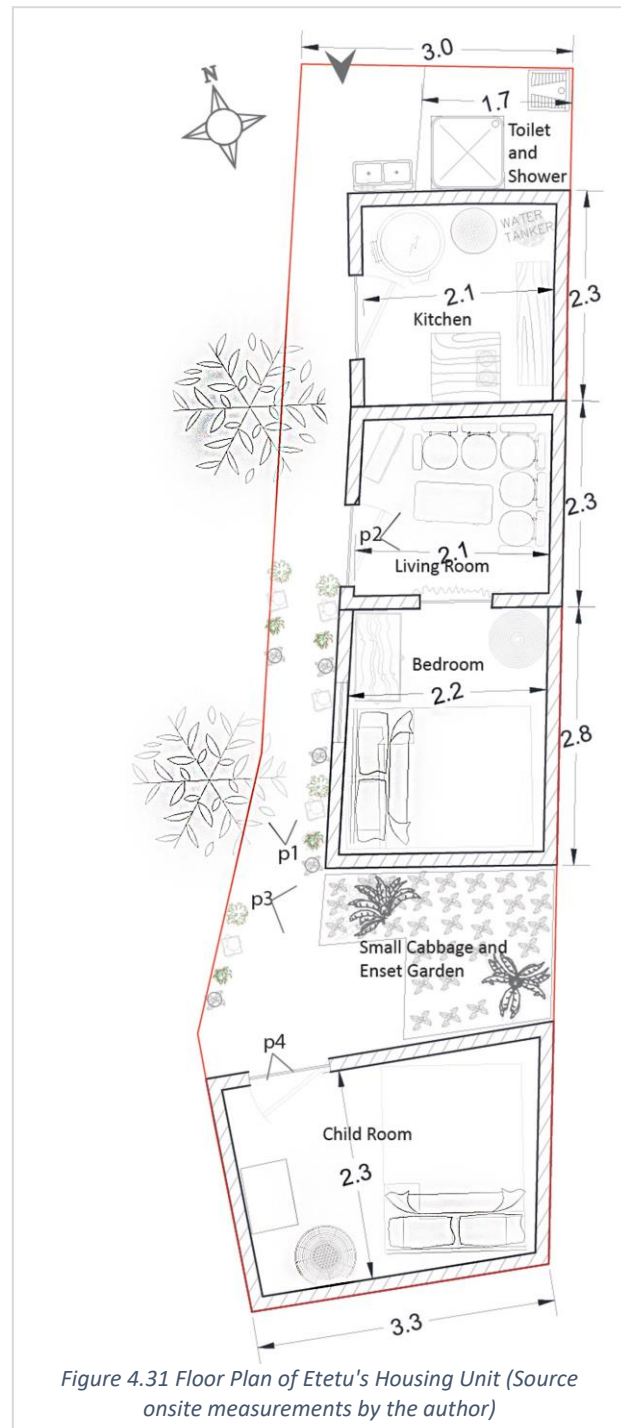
Floor Plan of Etetu's Housing Unit (Source onsite measurements by the author)
